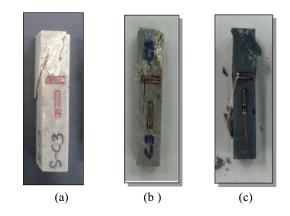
Failure patterns of grouts under compression (a) Grout A (b) Grout B and (c) Grout C
